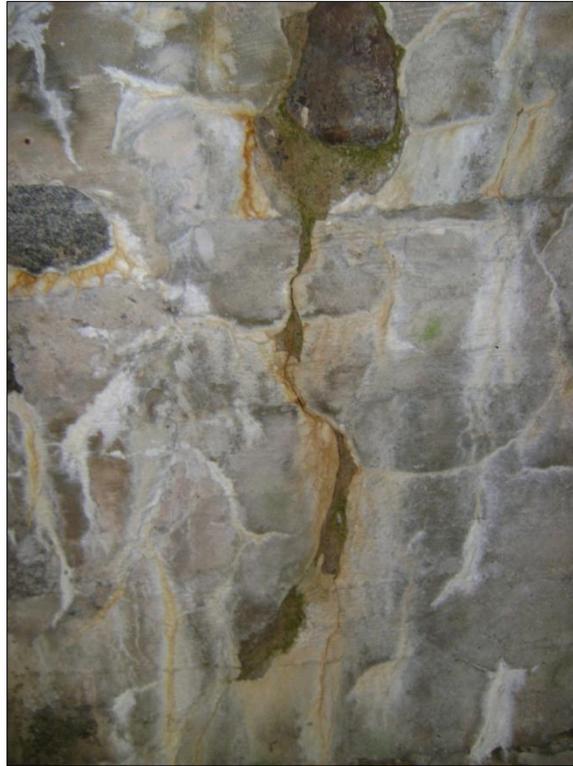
Looking Up: Large Longitudinal Crack Across Arch
